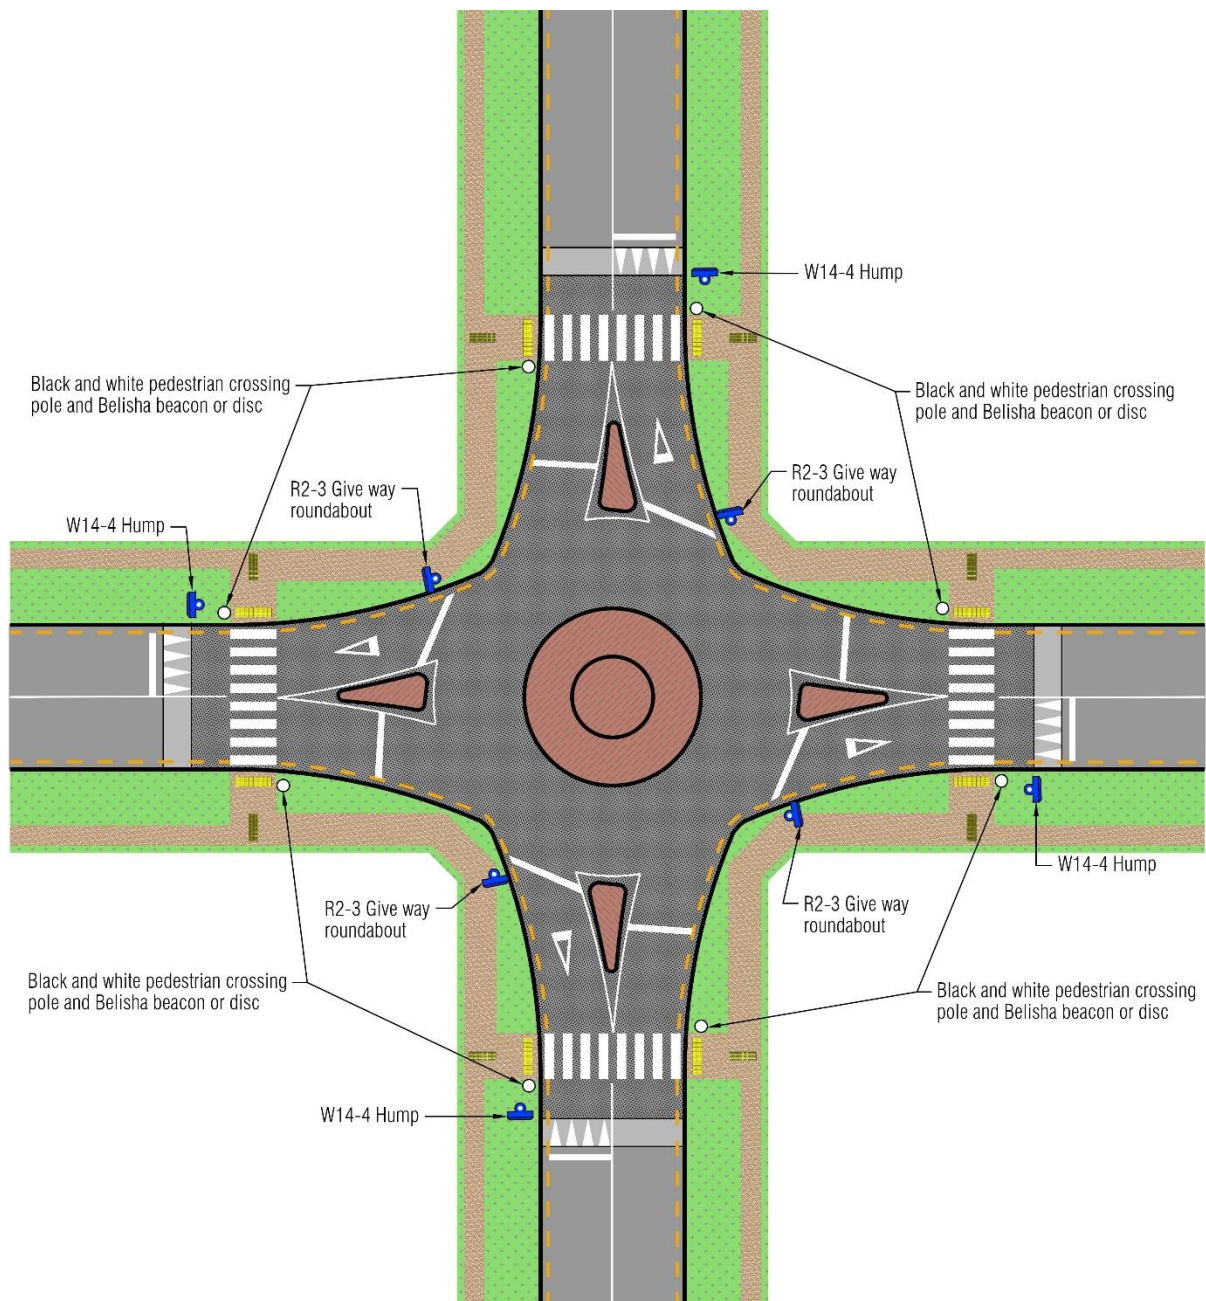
General layout for roundabouts with raised safety platform and pedestrian crossings (zebra)
